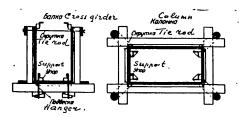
Fastening of the concrete forms to the welded steel skeleton of a girder and of a column;
